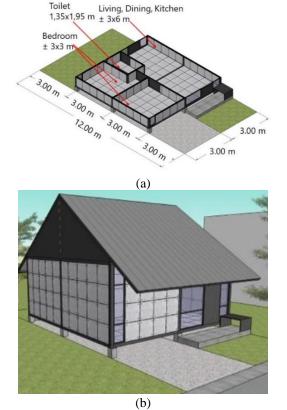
(a) Isometric 3D Plan and (b) Perspective View of Prefabricated Housing Prototype Design
